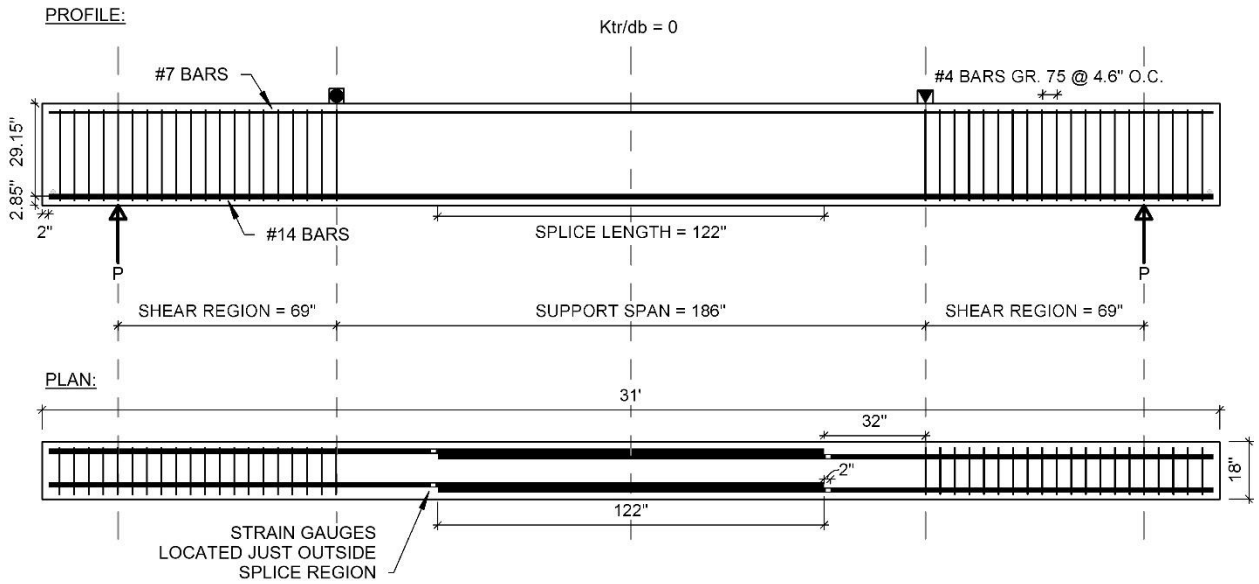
Profile and plan of 14-f (1 in. = 25.4 mm)
